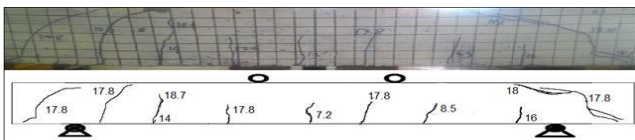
(c). The 20P10E beam specimen cracking pattern (Rahman et al., 2019).
